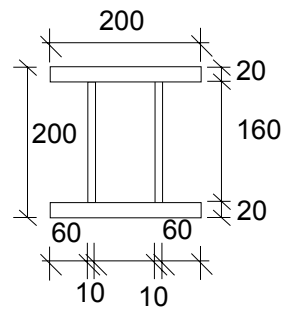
Steel beam simulating upper wall in tests B1, B2 and B3. Weight of the beam was 1.7 kN and length 2.0 m.
